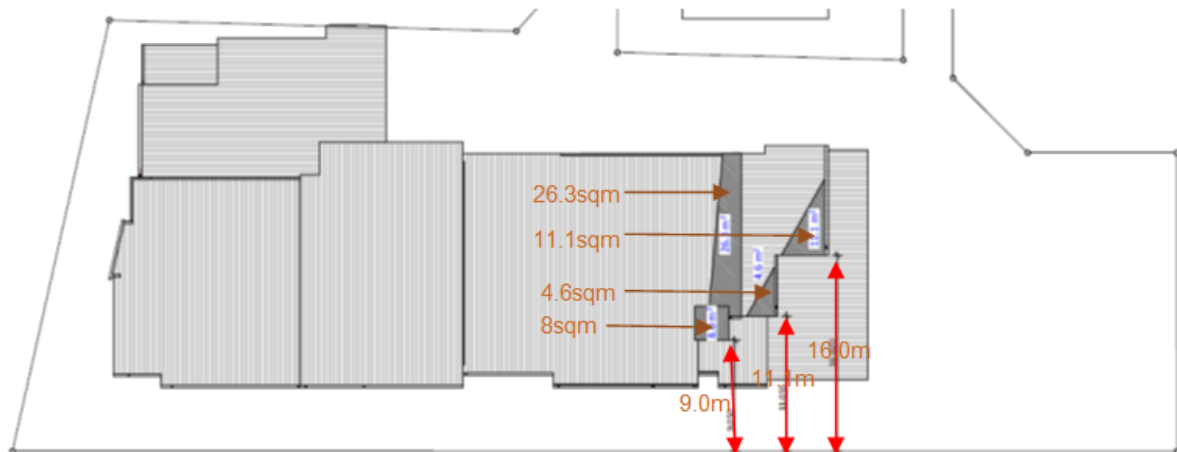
Roof Plan indicating the non compliant parts of the roof (Drawing No. DA-05.29 DA7)
